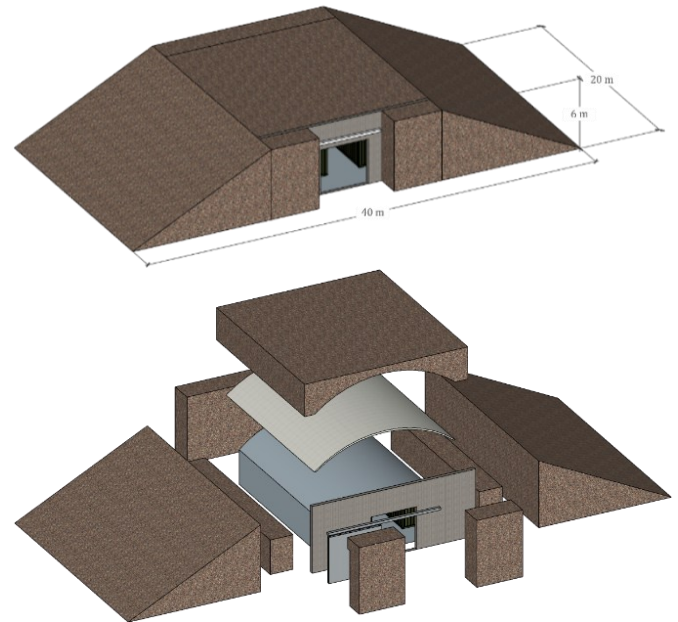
Impression of the stabilized earth magazine (top) and exploded view drawing (bottom). Dimensions are indicative.
